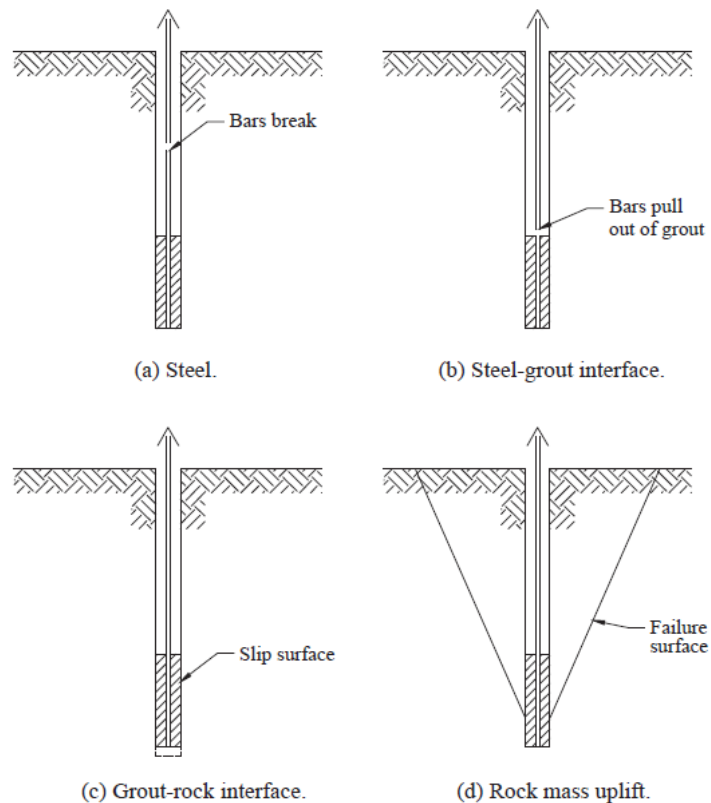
Four failure causes of post-tensioned anchors – (a) tensile failure of the steel tendon, (b) failure of the interface between steel tendon and grout, (c) failure of the interface between rock and grout and (d) uplift failure of the rock mass [11]
